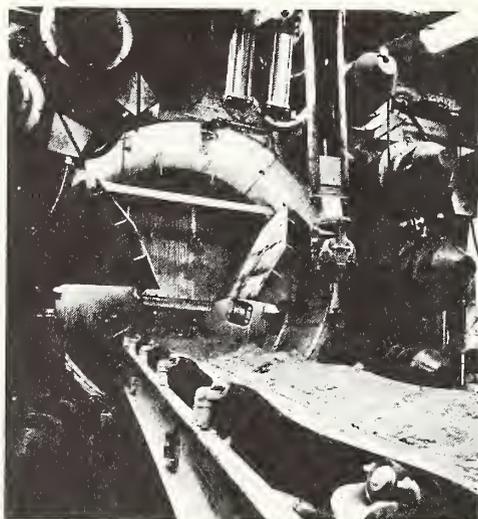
Synchronous motors mounted on the cutting head carrier
